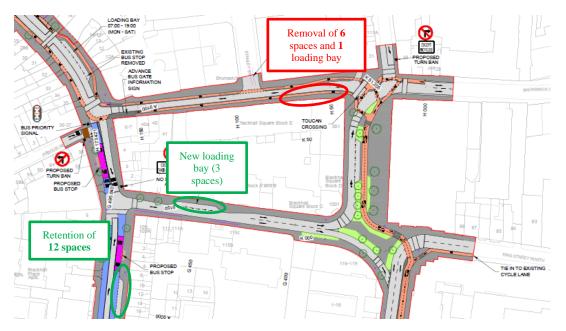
Proposed scheme design parking changes for Brunswick Street North, King Street North and the northern section of Blackhall Place
